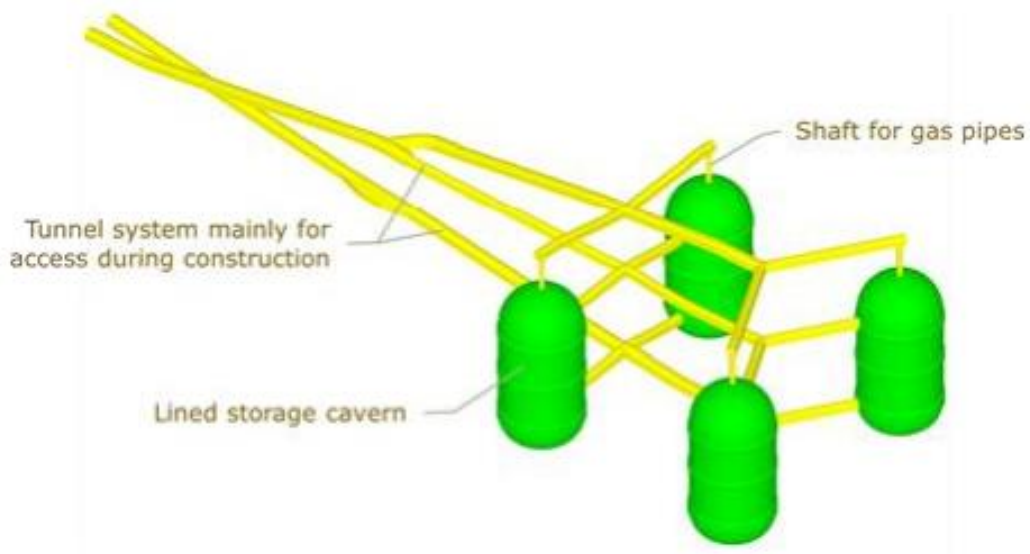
Typical layout of lined underground LNG storage caverns on site (Tengborg, Johansson, & Durup, 2014)
